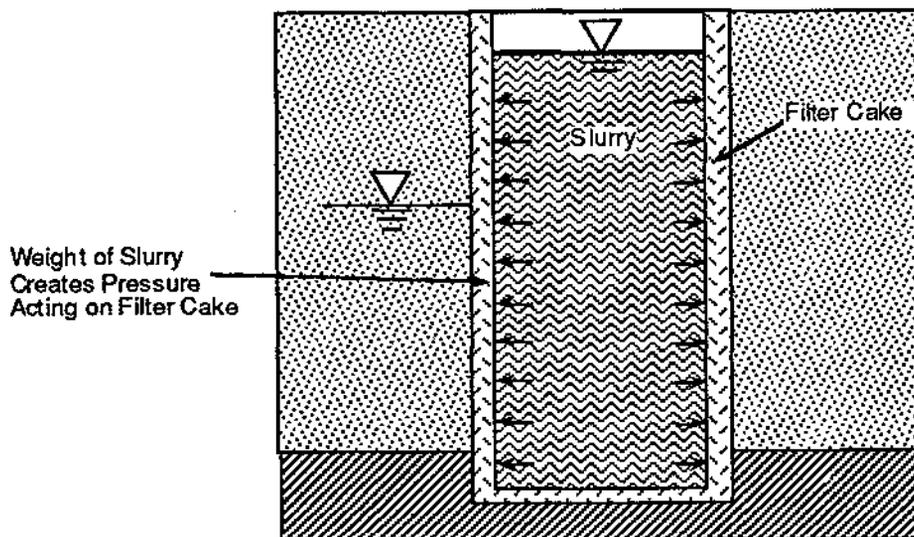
Hydrostatic Pressure from Slurry Maintains Stable Walls of Trench.
